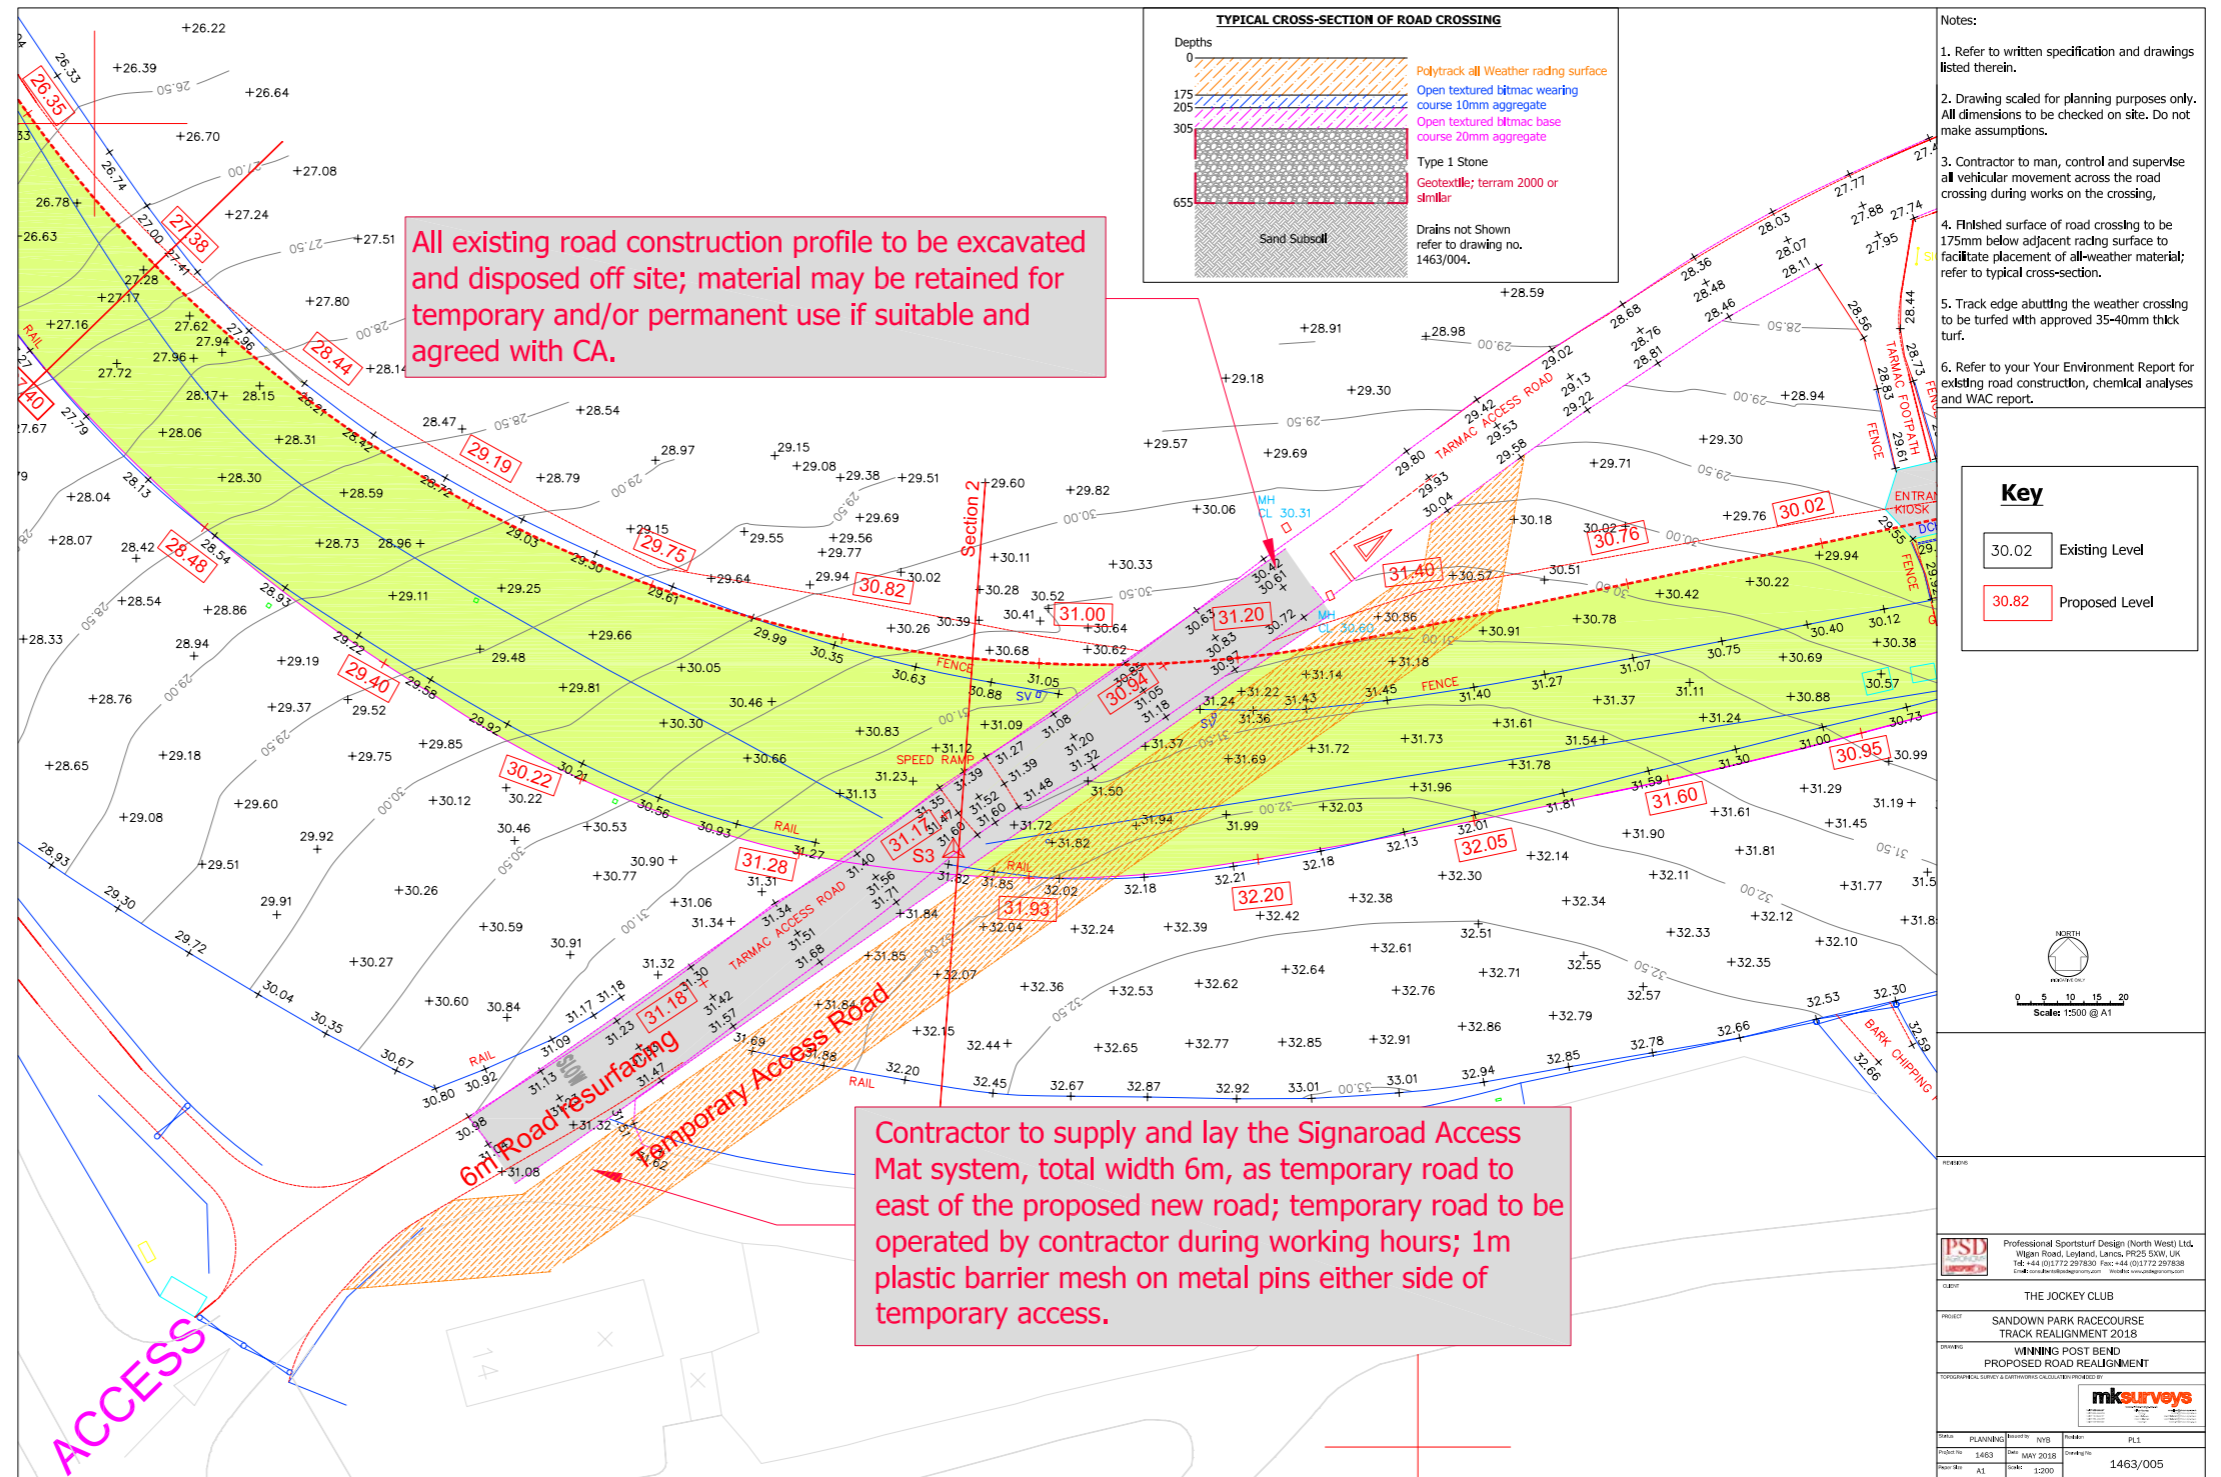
Proposed Layout Site E1 - Refer to Application Drawing 1463 005 T1
